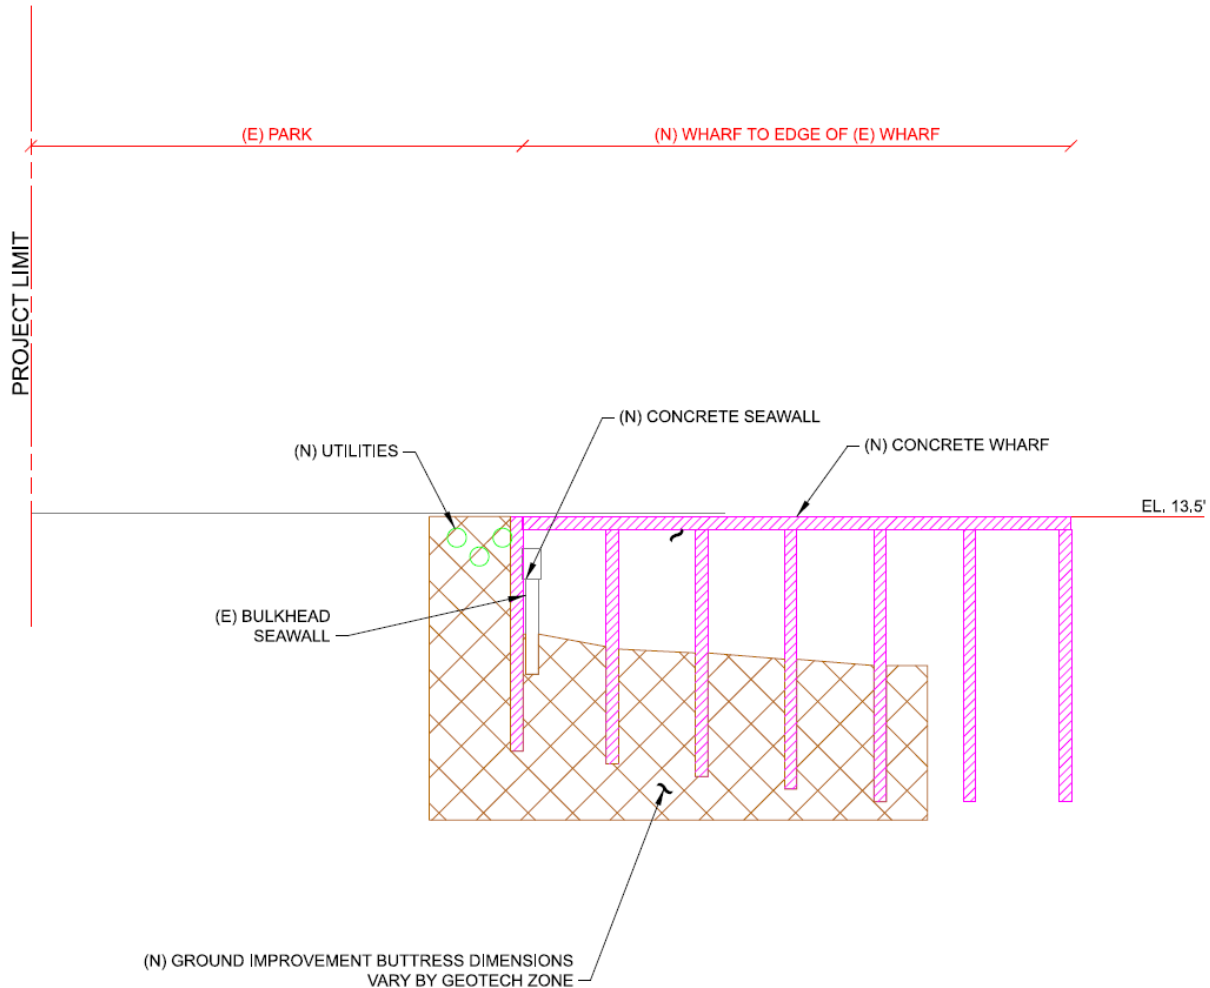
Section 5 Recommended Plan (Reach 3, Pier 28)
